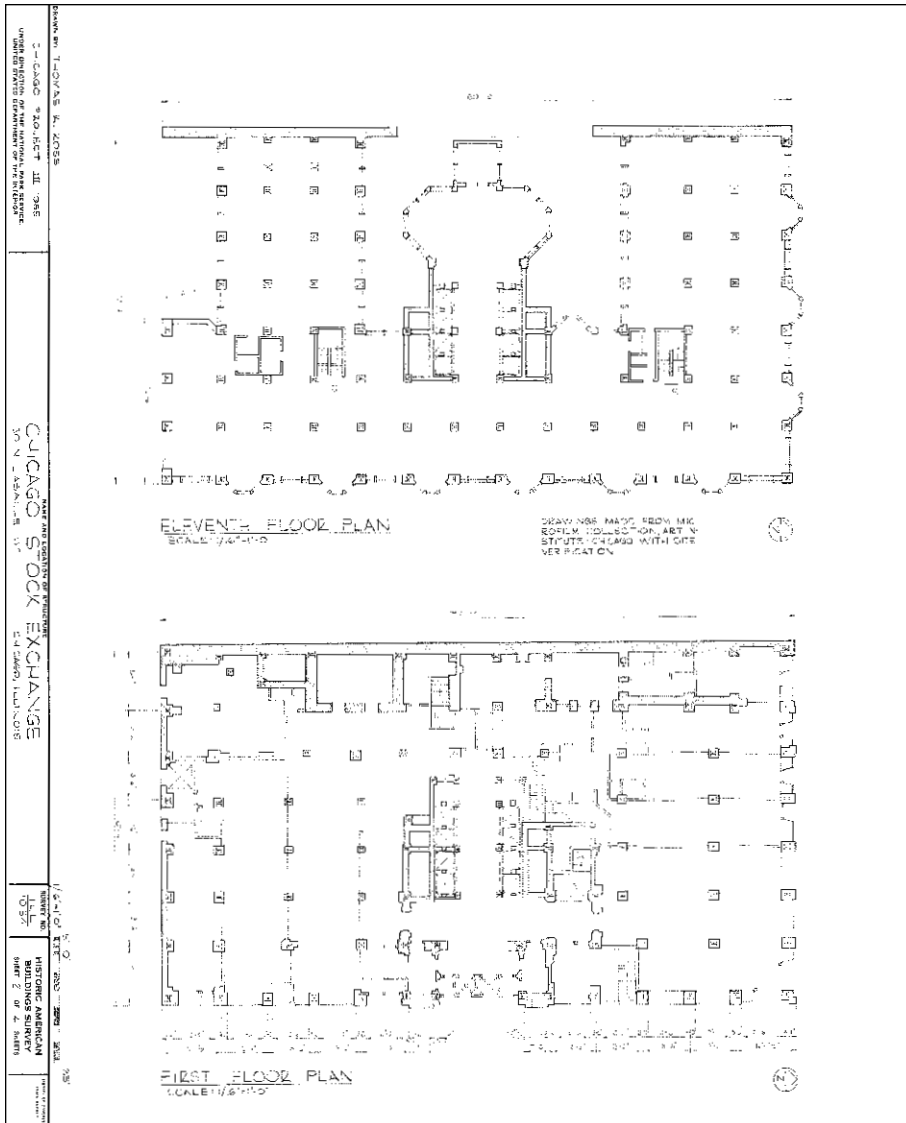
Chicago Stock Exchange, floor plans. Note the thick west wall, which was self-bearing. Courtesy of the Library of Congress, Prints and Photographs Division, HABS ILL, 16-CHIG, 36.
